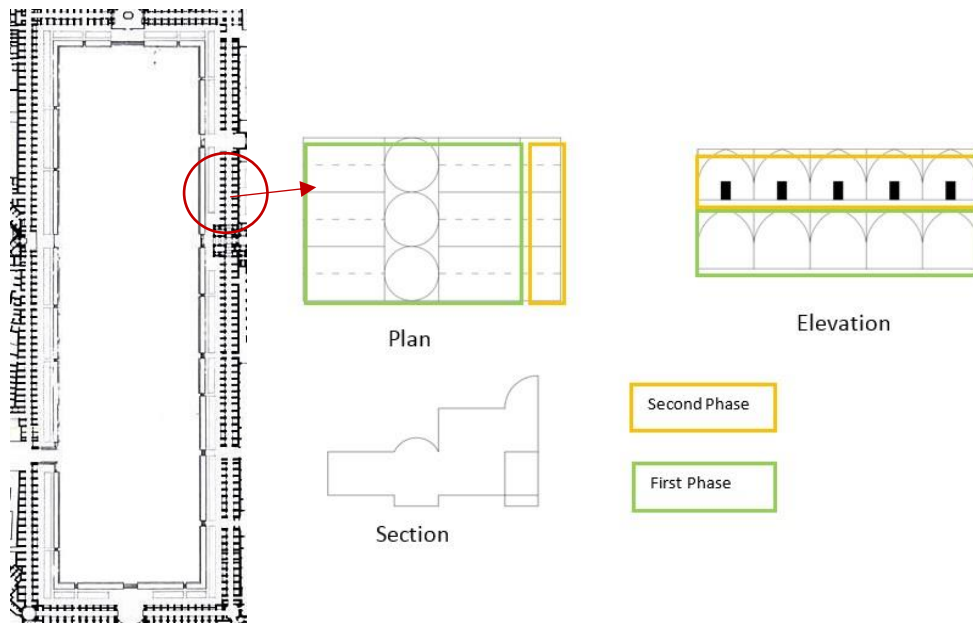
Plan, Elevation and section of the Maidan surrounding the Bazaar (Author 2012)
